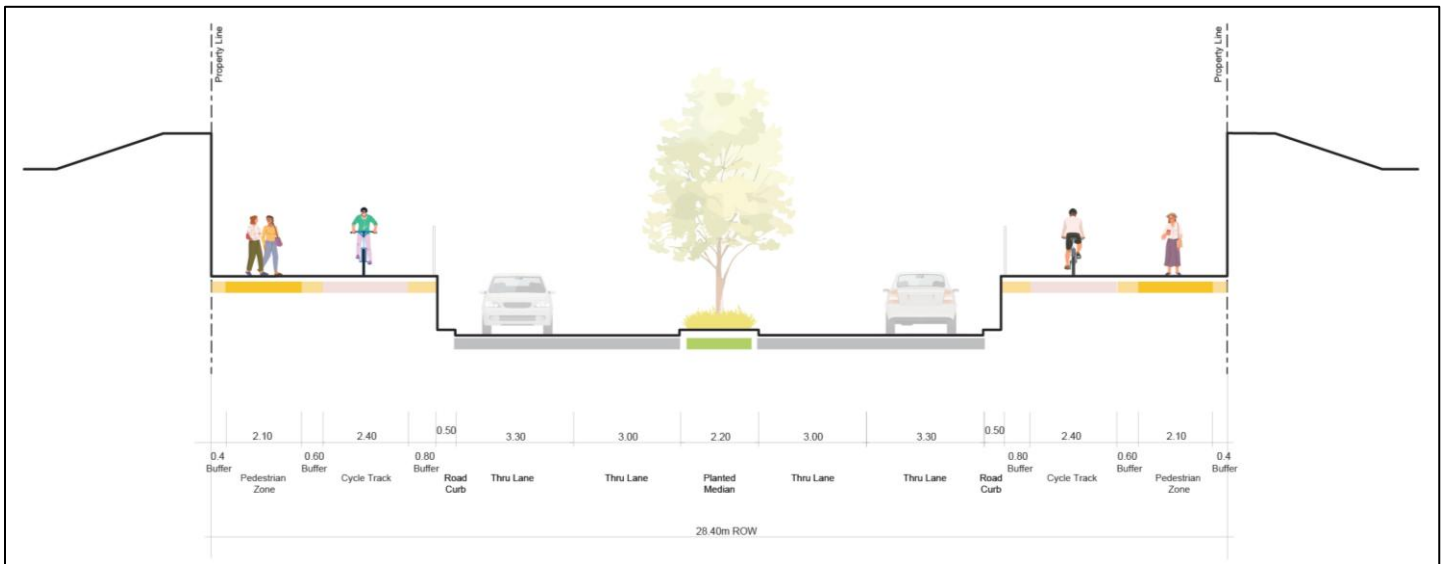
Northern Street (Underpass – Open to Sky) Cross-Section – Option 3
